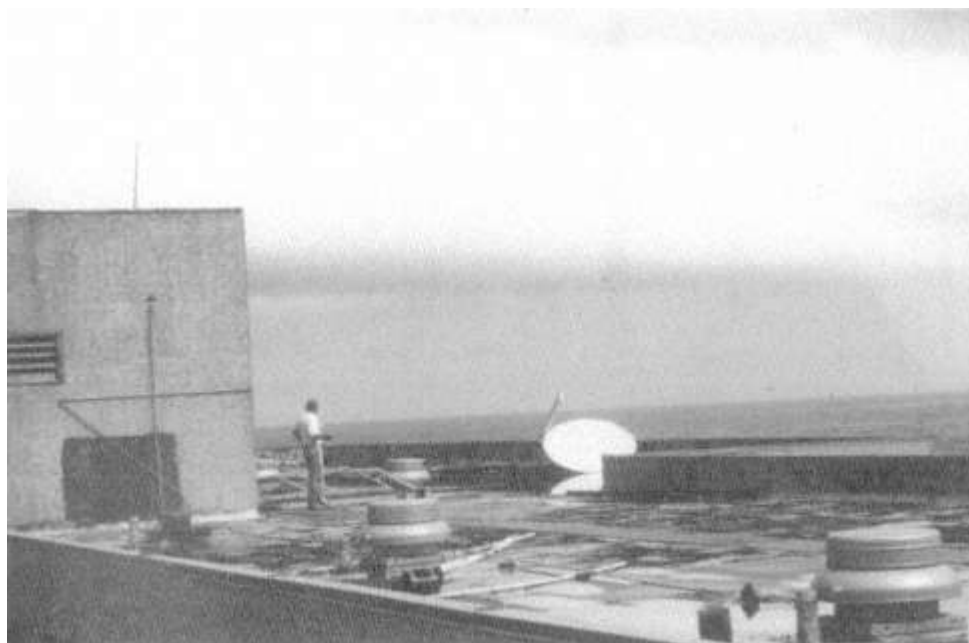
Damaged satellite dish is typical of damage associated with roof-mounted mechanical equipment.
